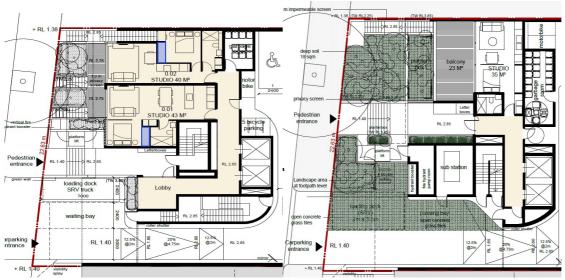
Original Ground Floor Plan Revised Ground Floor Plan
